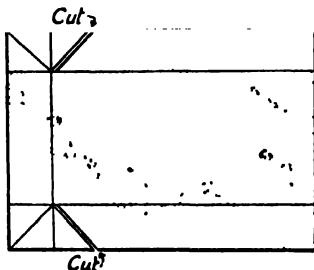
Marking out and cutting sheet for drip of lead box gutter. Fig. 38. Completed drip, showing upright burning on gusset.
